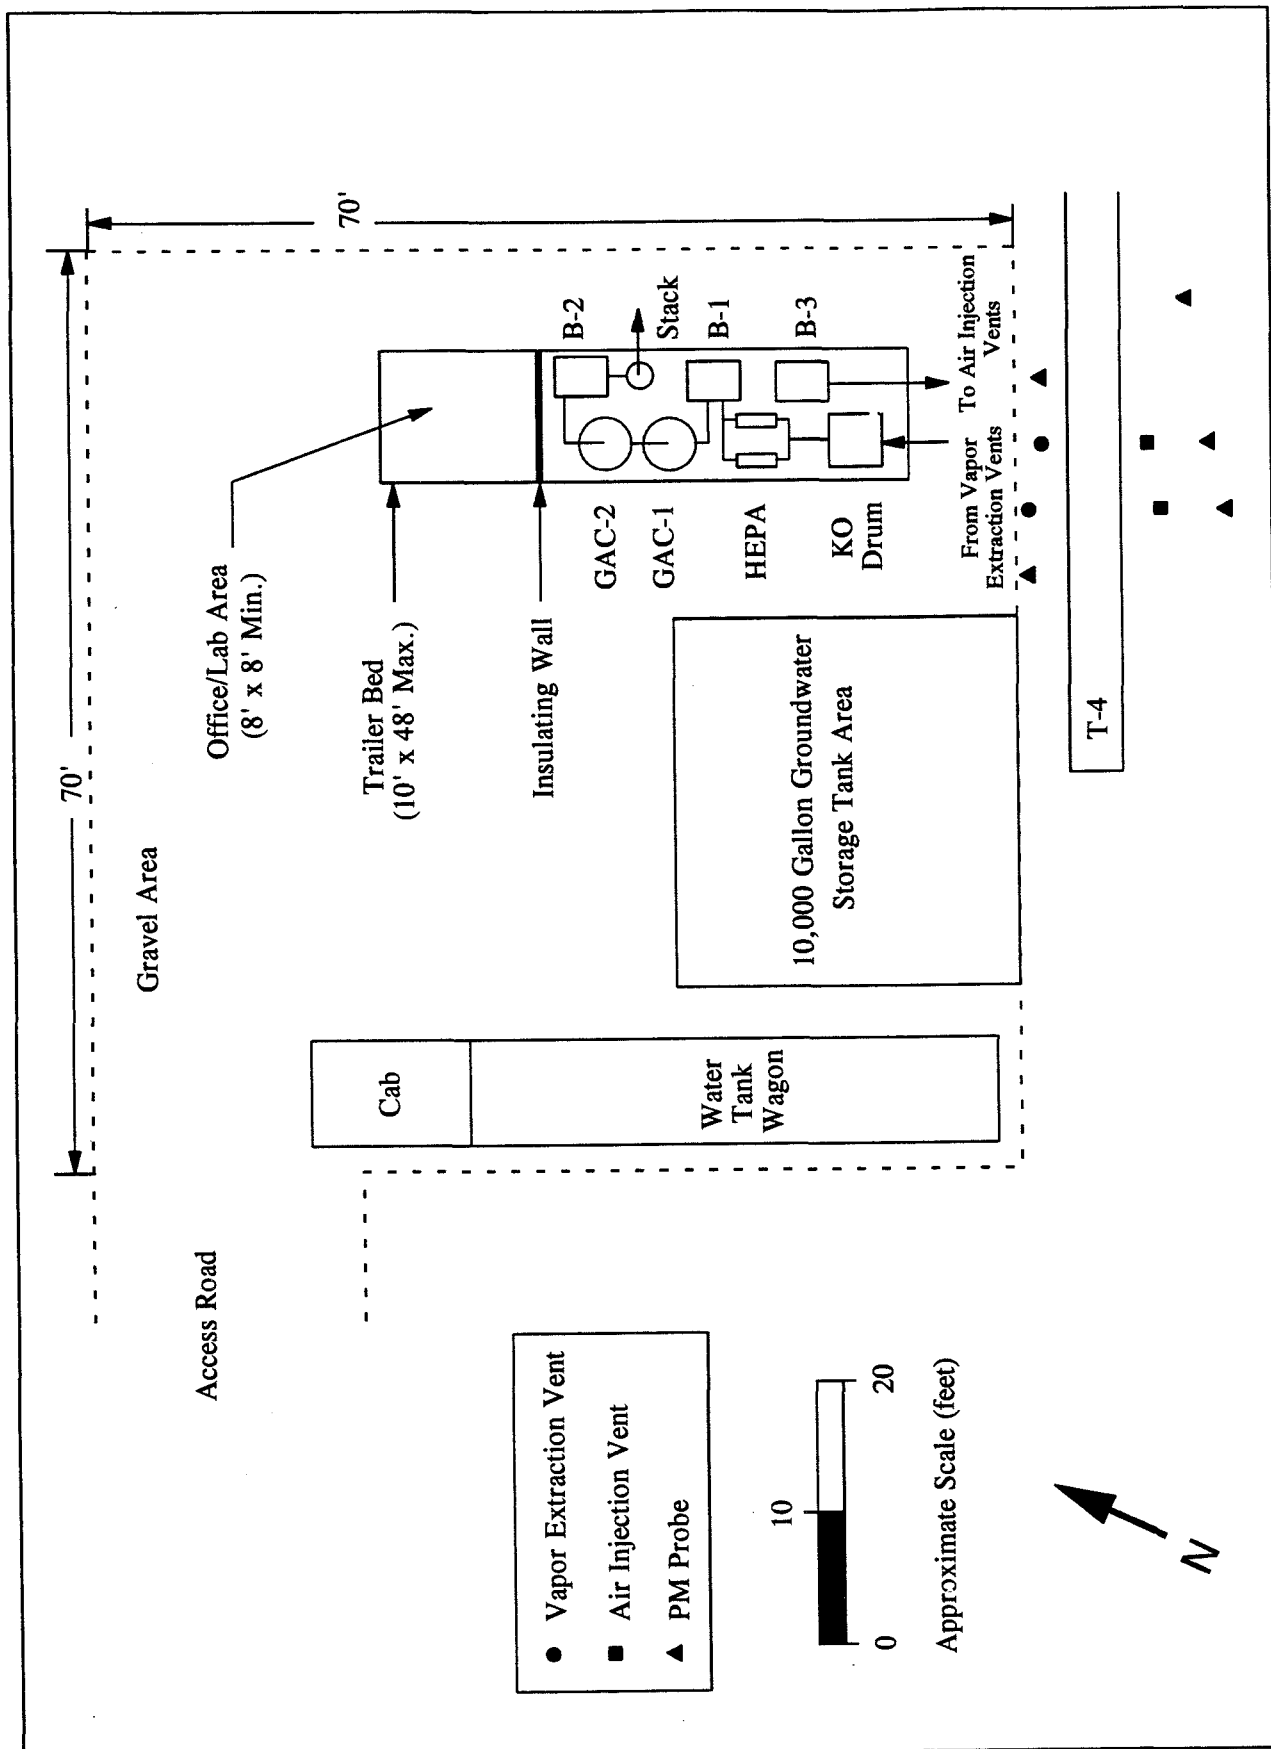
SCHEMATIC OF WORK SITE LAYOUT
